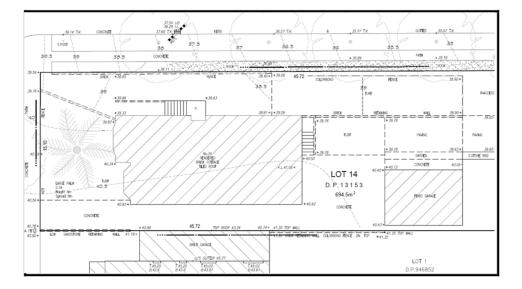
Site Survey (Source: Survey prepared by J. P Bates & Inwood Surveyors provided by the applicant)
